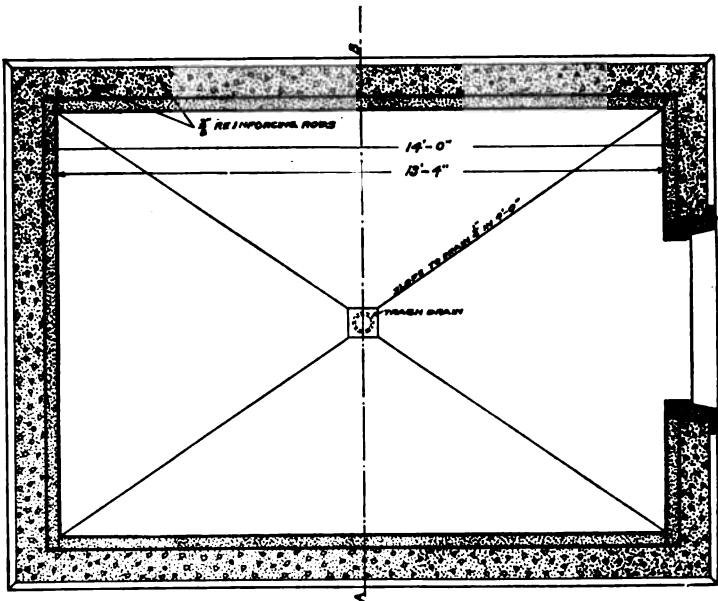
Small concrete ice house. (Ground plan of fig. 10.)
